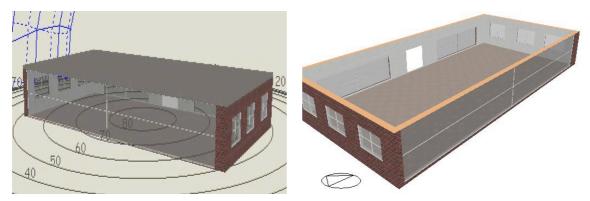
South View of Office Building & South South West View of Office Building illustrating interior (Graphic)
